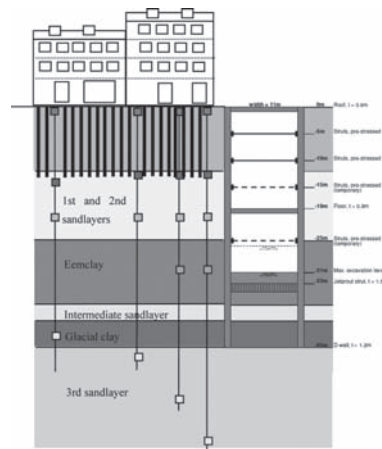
Cross section of Ceintuurbaan station with soil profile and extensometer locations.
